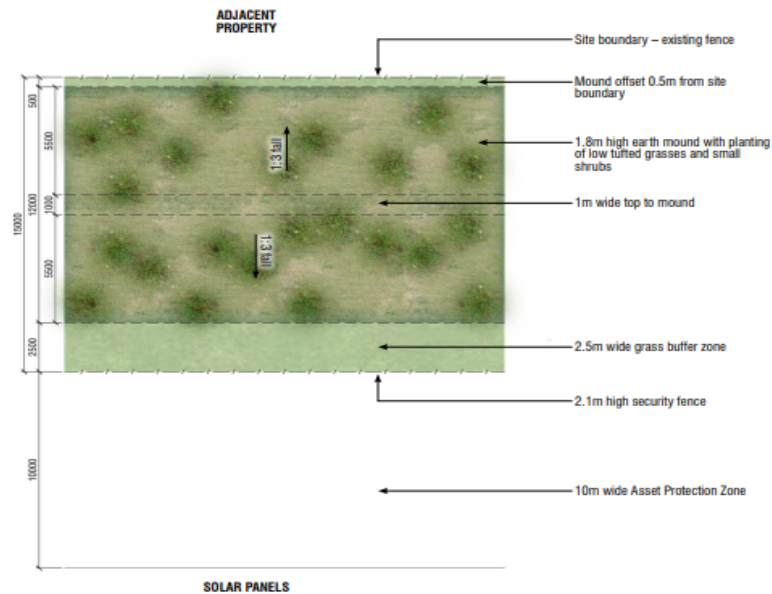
Cross sectional example of planting layout with infrastructure.
